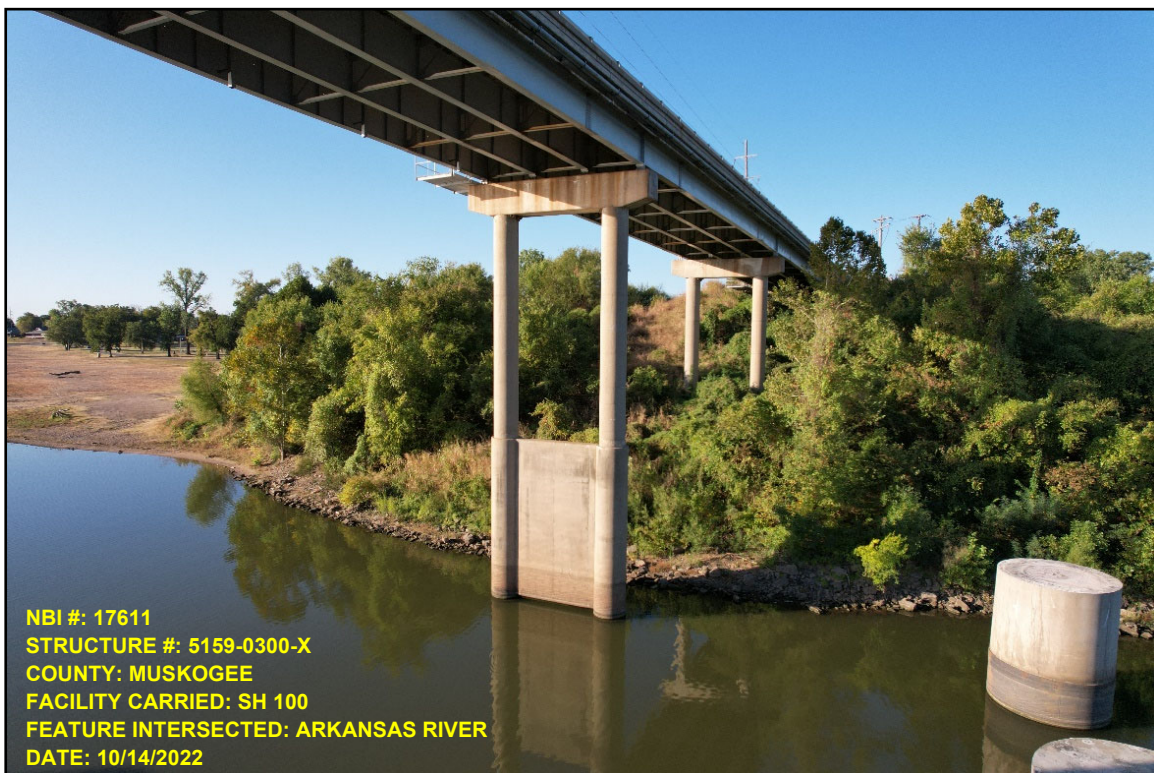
Pier 2, Typical Configuration of Piers 1-4, and Piers 7-14
